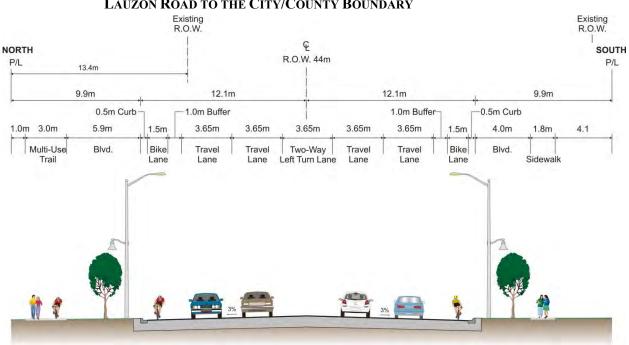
TYPICAL CROSS-SECTION COUNTY ROAD 42 LAUZON ROAD TO THE CITY/COUNTY BOUNDARY
